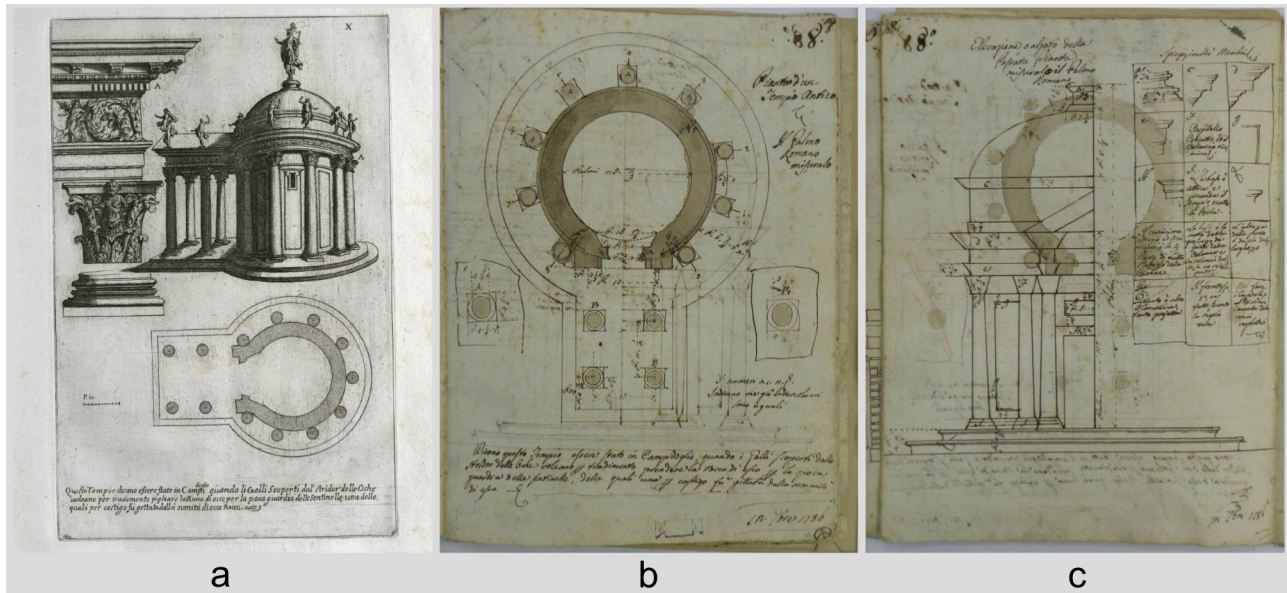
Tempio antico [in Campidoglio]: a) Montano's description: Montano 1684b, tav. X; b) GBC, plan; c) half section with details: Cipriani 1786-1791, cc. 13r, 13v.
